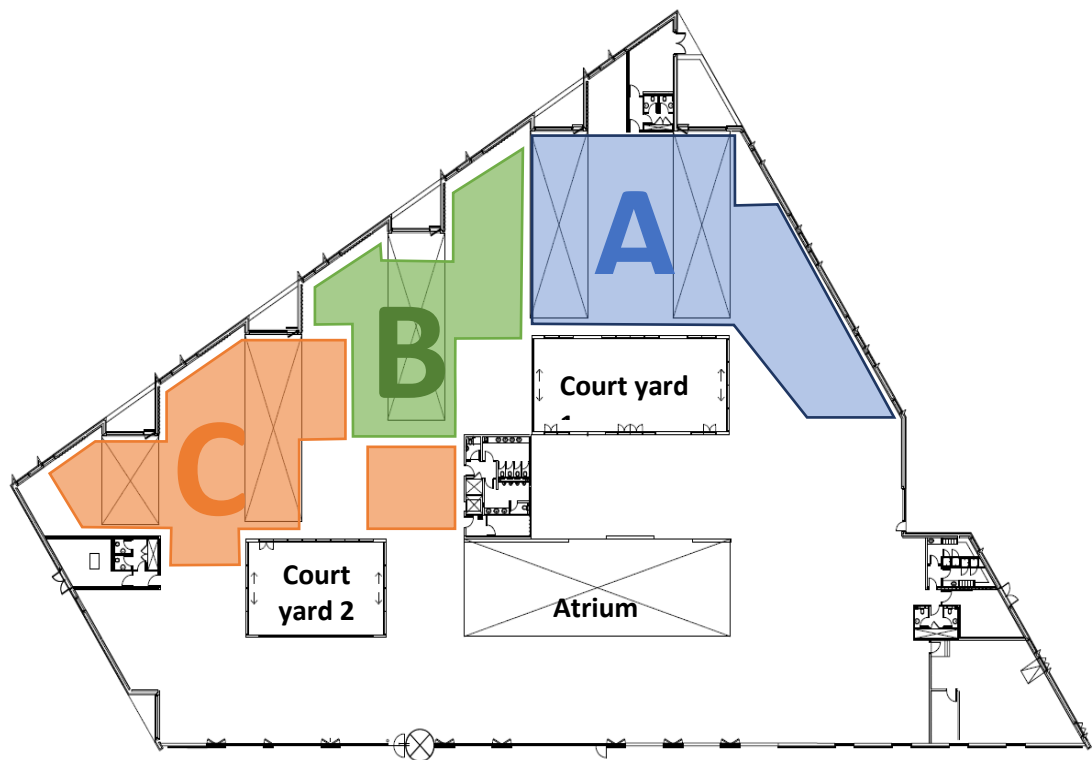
6: The ground floor plan of Building 2 and the department locations
